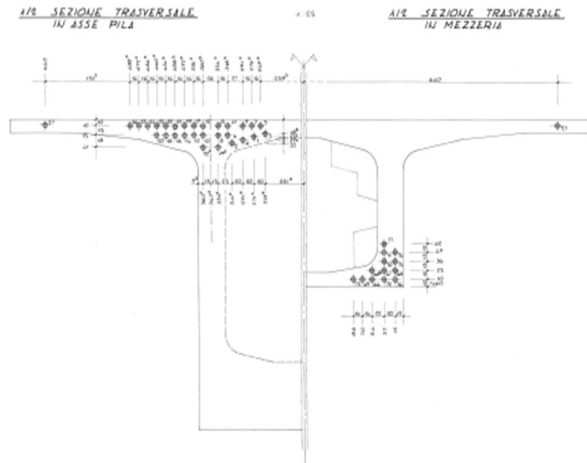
Cross-sectional view and arrangement of tendons between pier 1 and pier 2.
